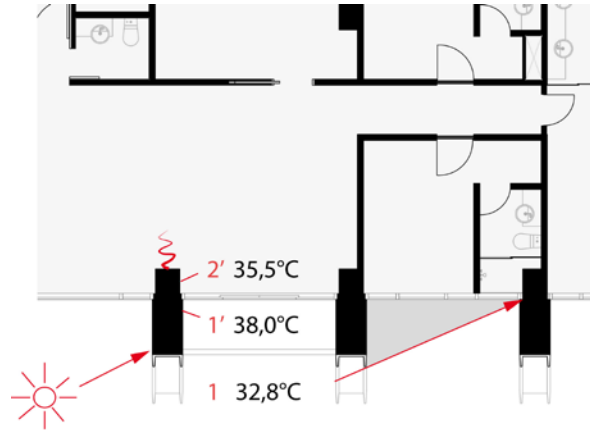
The building structure causes shadow to fall on the glazing, the MET residential high rise Bangkok, floor plan unit 29th floor © WOHA architects, graphics modified by © Ferdinand Oswald, 2013.
